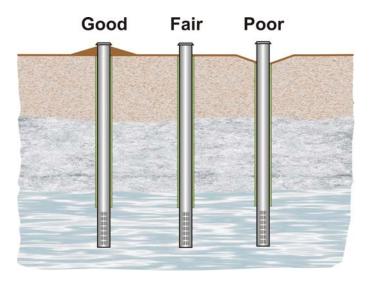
The ground surrounding the well should be mounded to prevent surface runoff from ponding around the well site. Source: AAFC-PFRA
